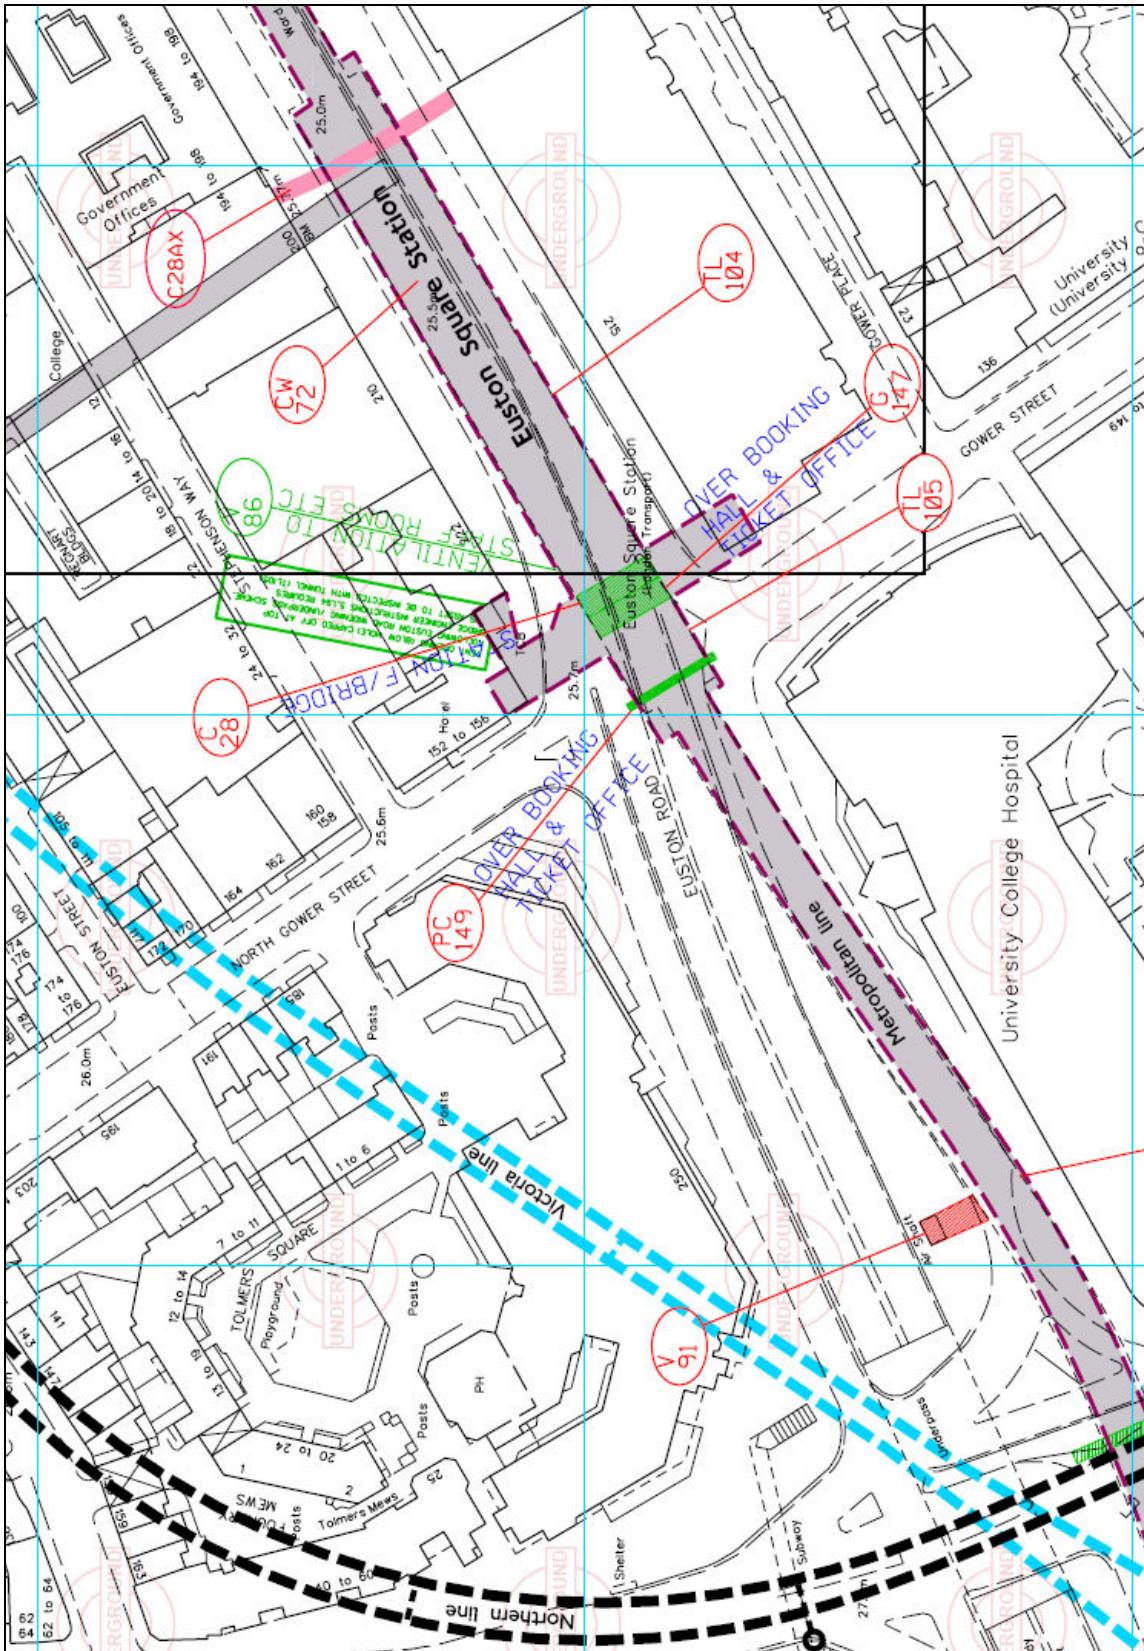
Excerpt from plan of underground railway and service tunnels (London Underground Ltd, not to scale)
